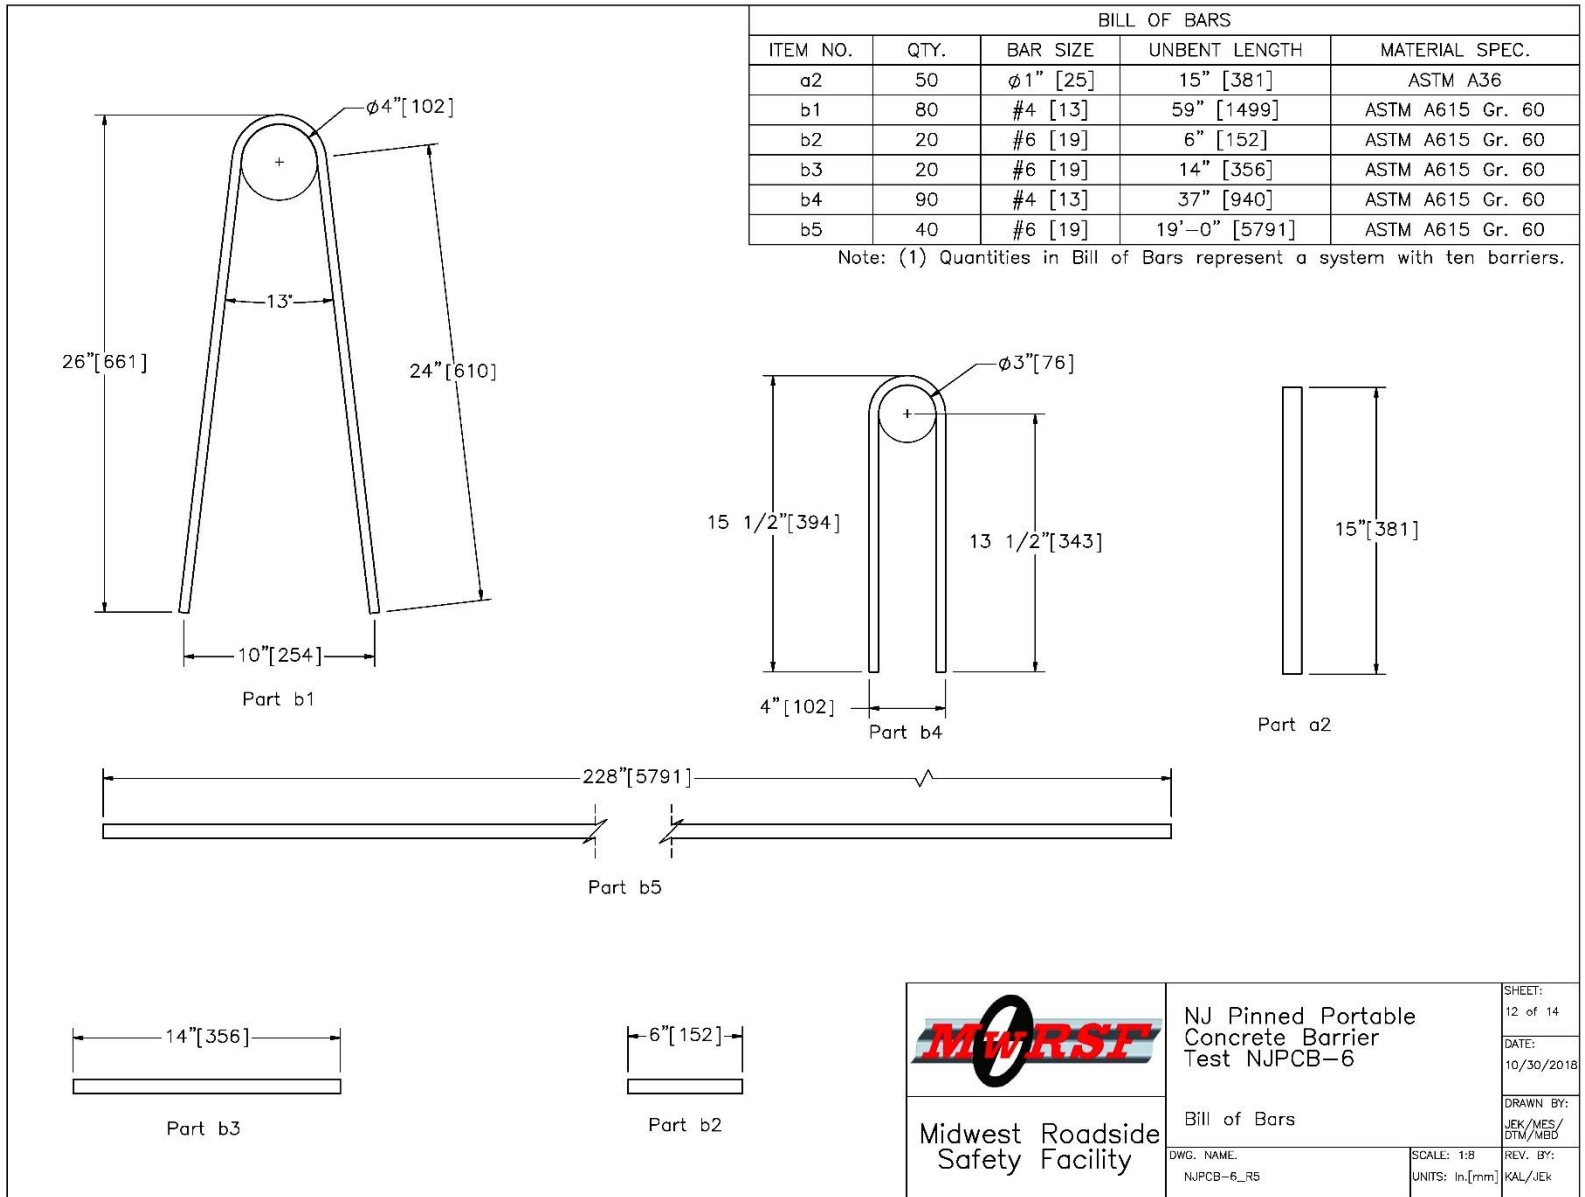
PCB Reinforcement Details, Test No. NJPCB-6
